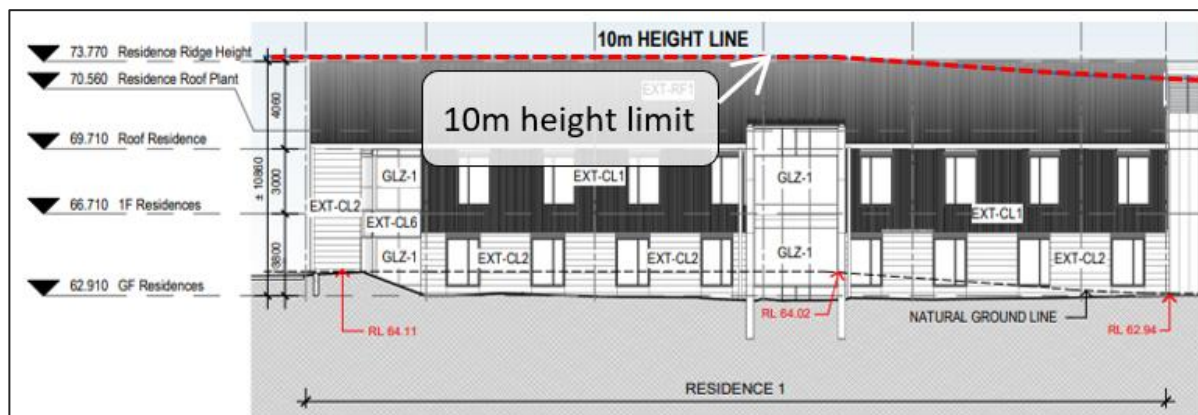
| Residential Pavilion 1 south elevation (Source: Applicant's SRtS)
